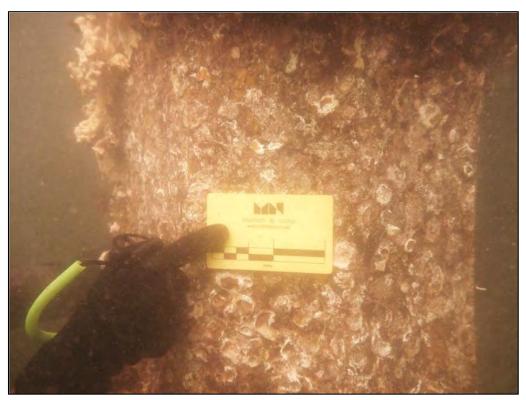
16-in. octagonal Pile 0:F at a typical Level II cleaning location below water.
